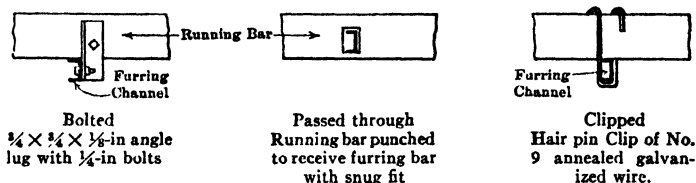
Methods of Connecting Furring Bar to Running Bar
